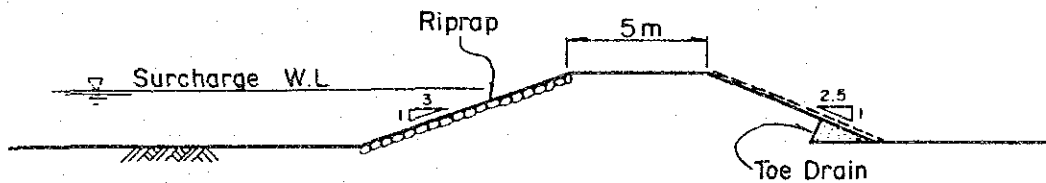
Typical Cross Sections of River Improvement Works (1/2)
